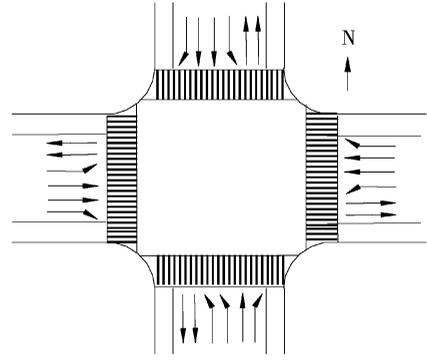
Intersection shape of Dashikou in Zhenjiang
